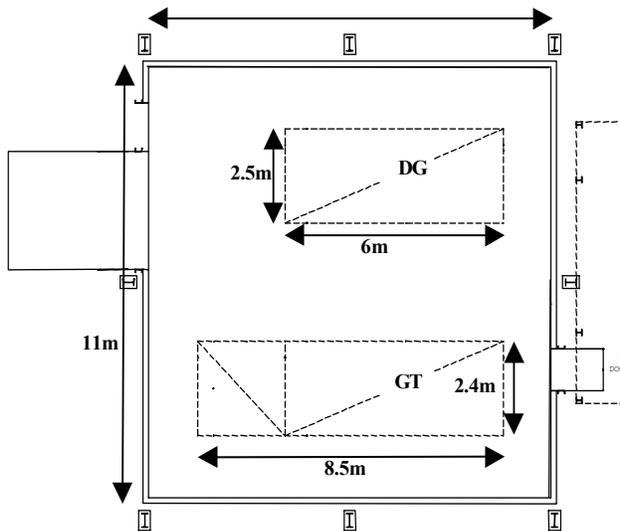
Plan view of WSA's large scale test enclosure at Horsea Island
